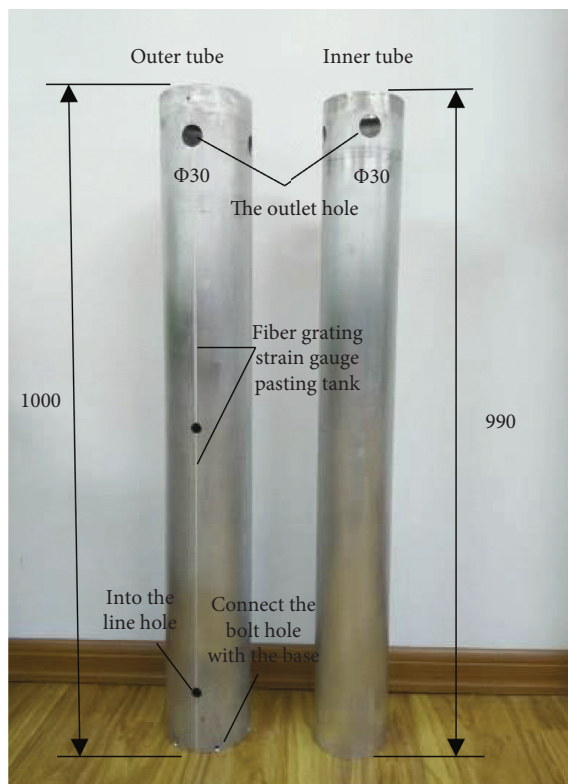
The inner and outer tubes of double-walled open-ended pile.
